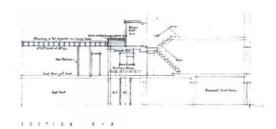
Section showing ground floor rear extension, part of the 1957 drainage plans.
